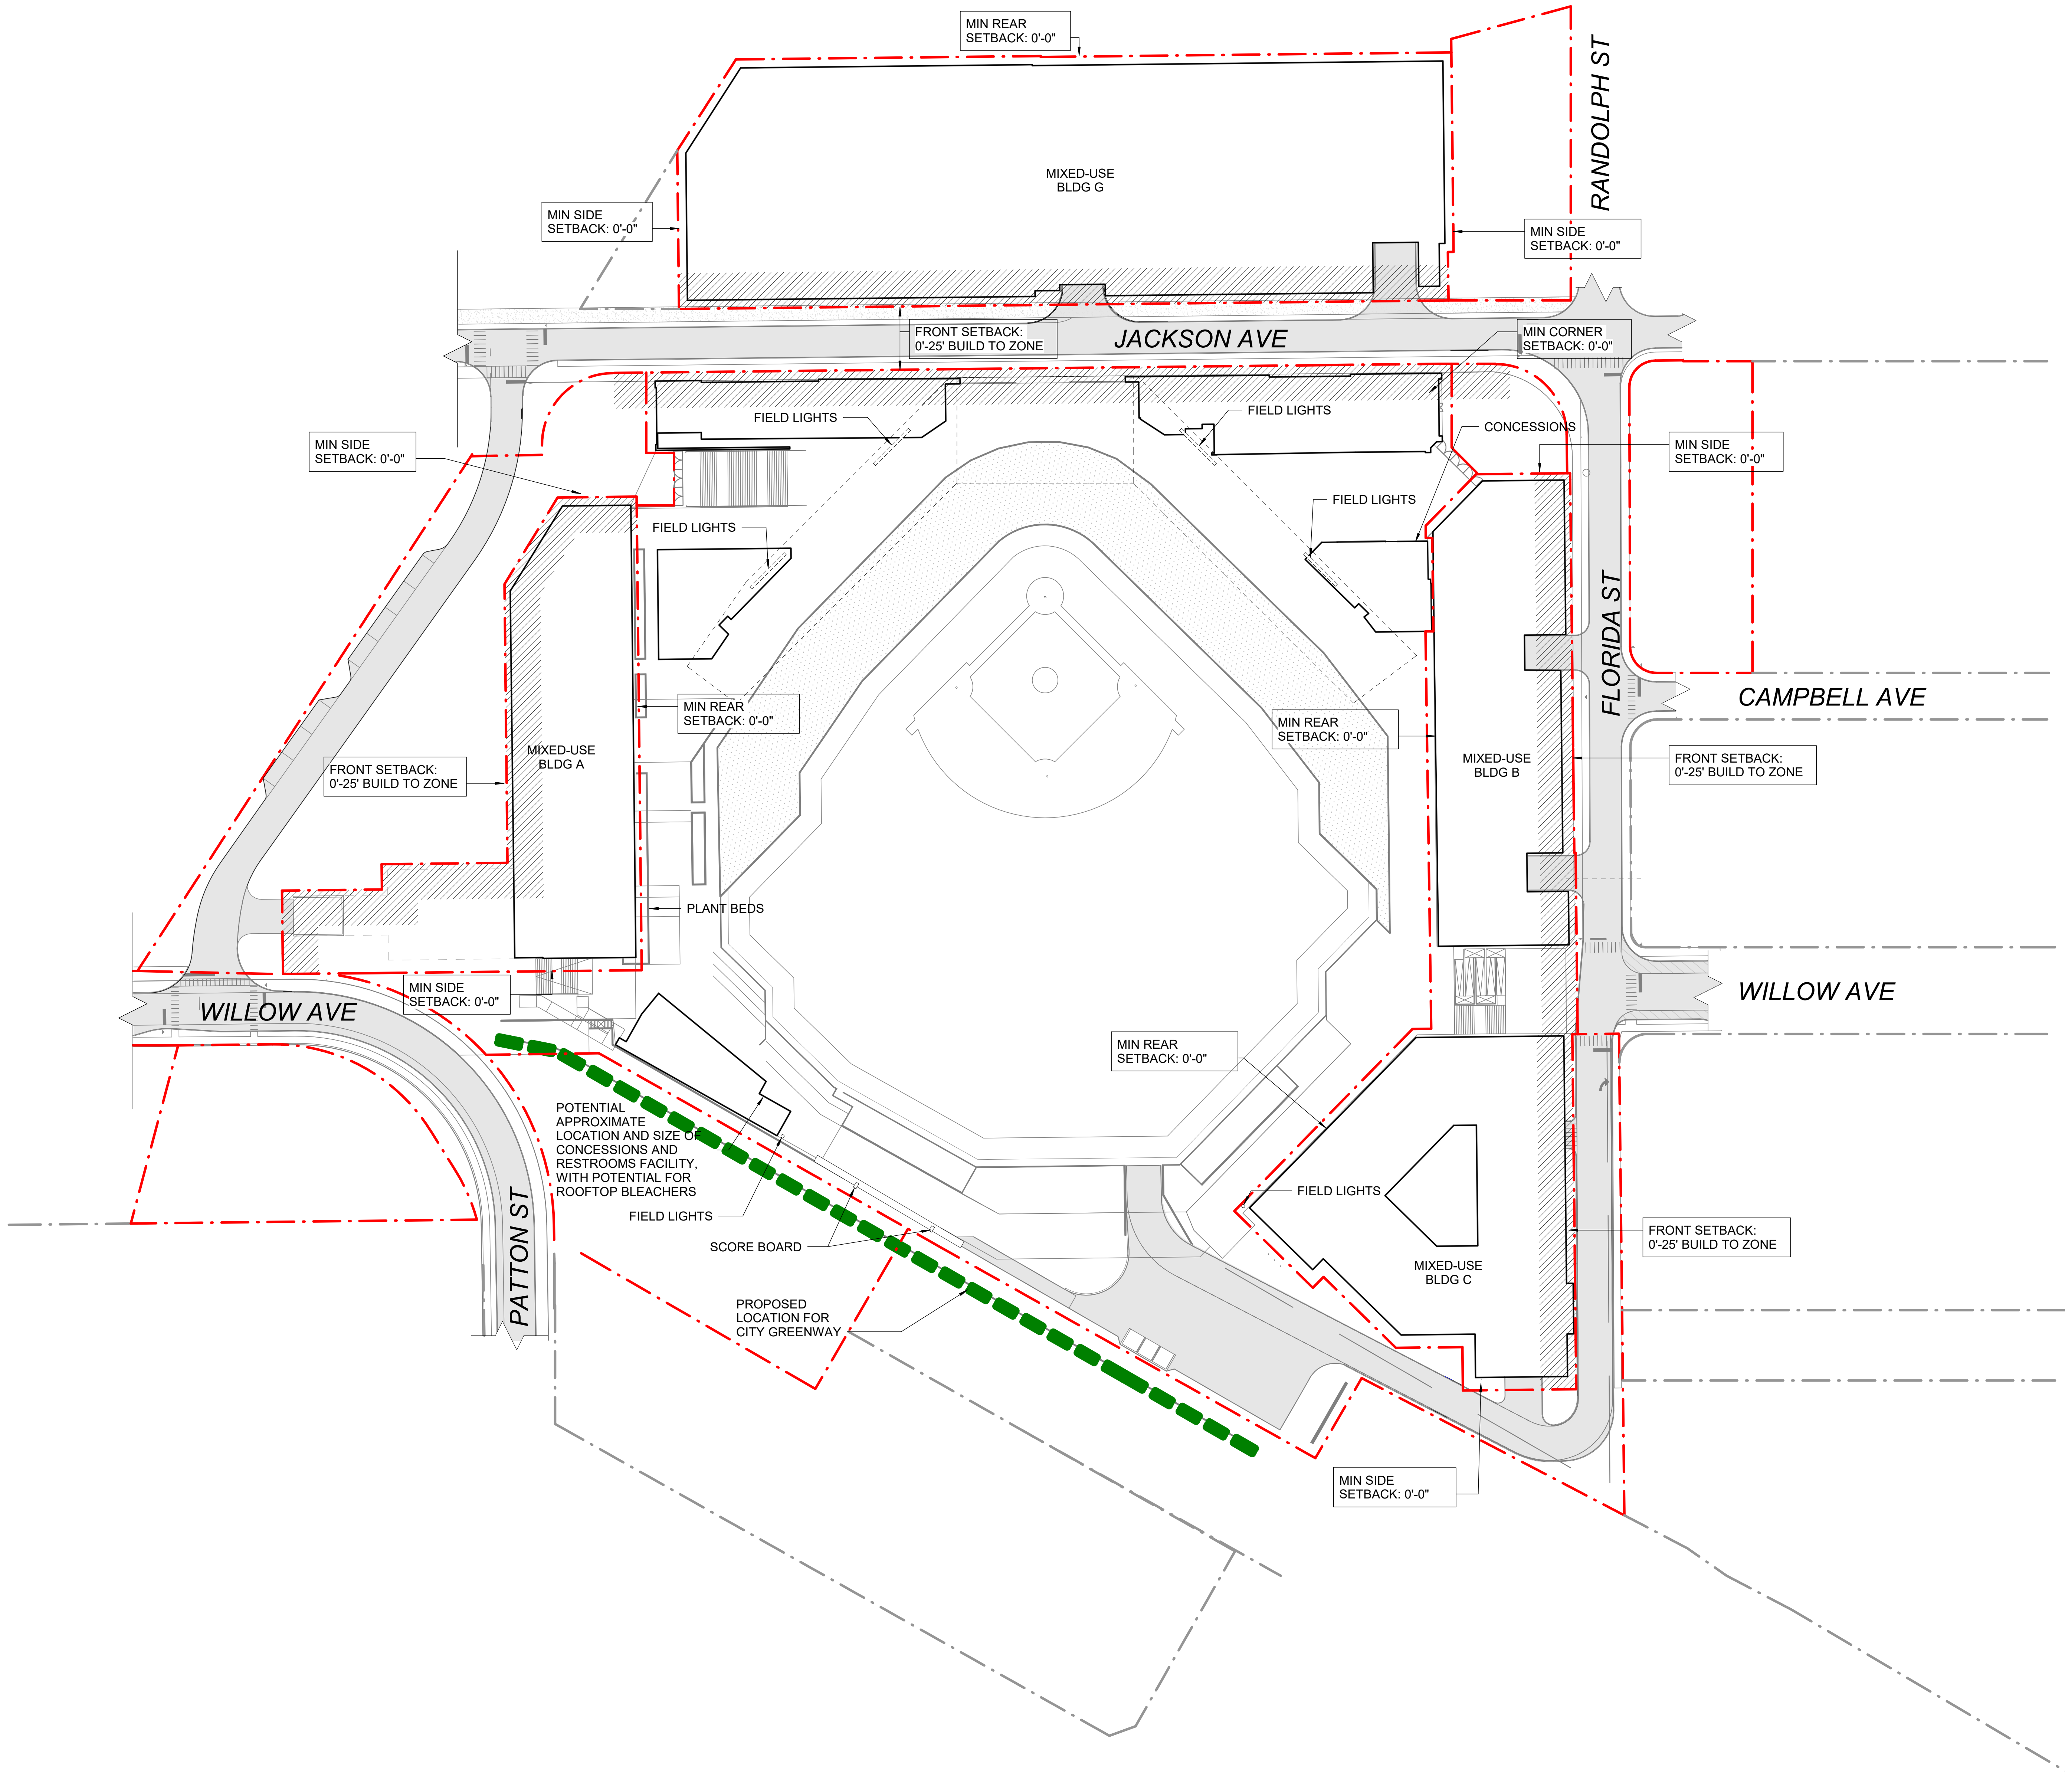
SITE PLAN PHASE 2 PROPOSED PROPERTY LINES AND SETBACKS
